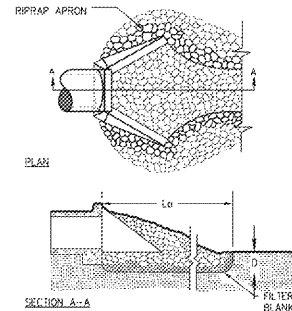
Riprap Outlet Protection (Modified From Ve SWCC)
